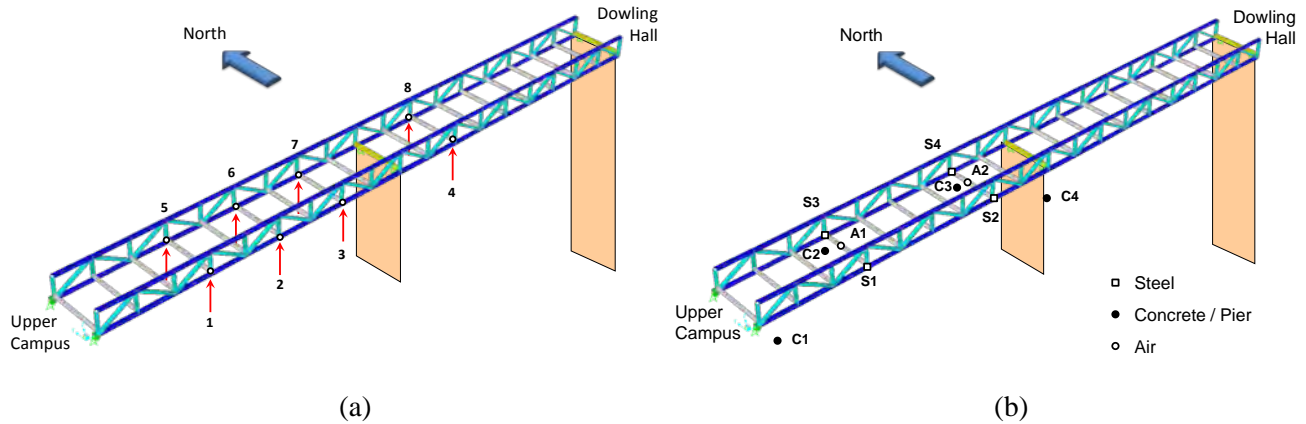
Layout of (a) accelerometers, and (b) thermocouples on the bridge
